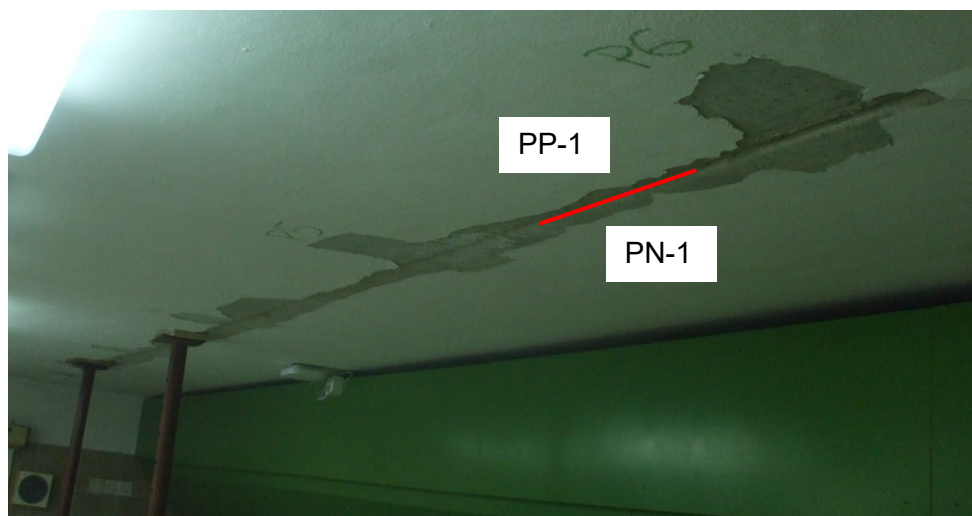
View of the reinforced concrete ceiling panels in room 2109
